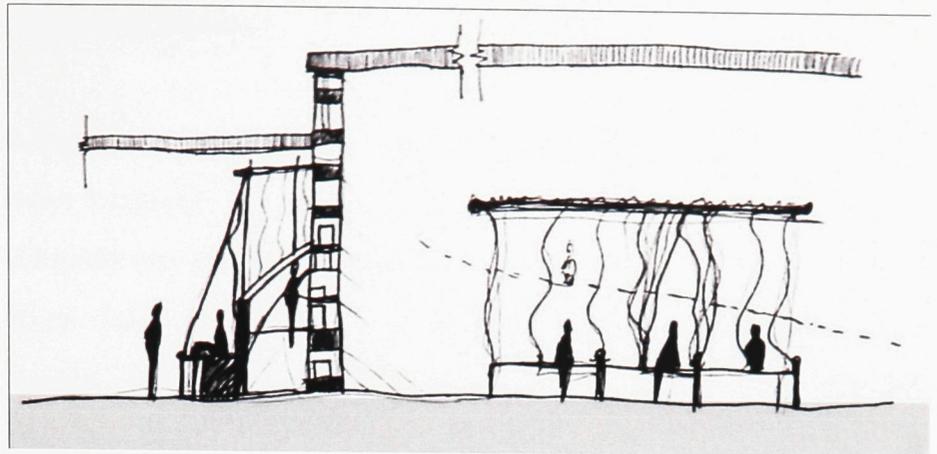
Sketches of stone printed fabric walls, fixed and un-fixed. Rebecca Han, 2011
